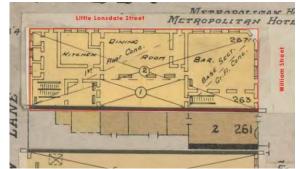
An 1895 MMBW plan showing the former Metropolitan Hotel and rear buildings. (Source: MMBW Detail Plan no 736, 1895, SLV)
